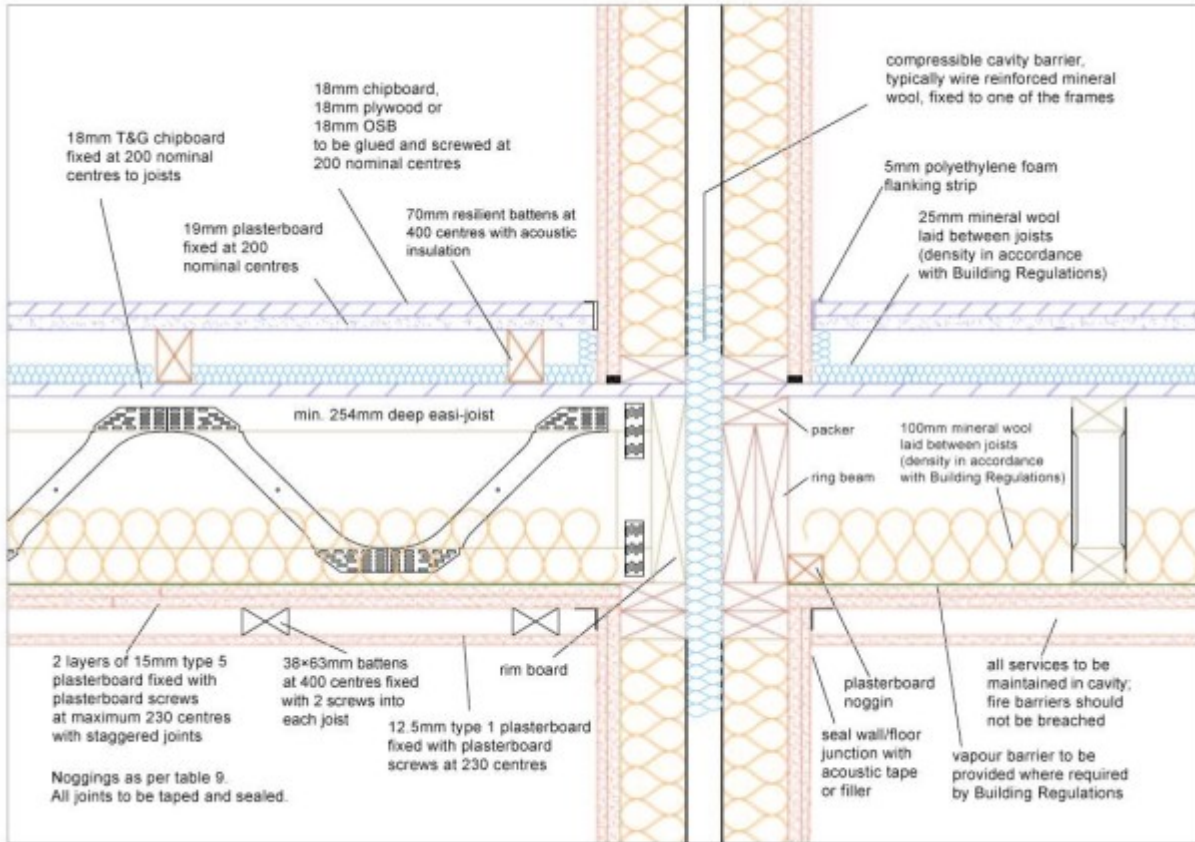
Cross section; compartment floor construction; junction with timber frame party wall; 60 minutes fire resistance
